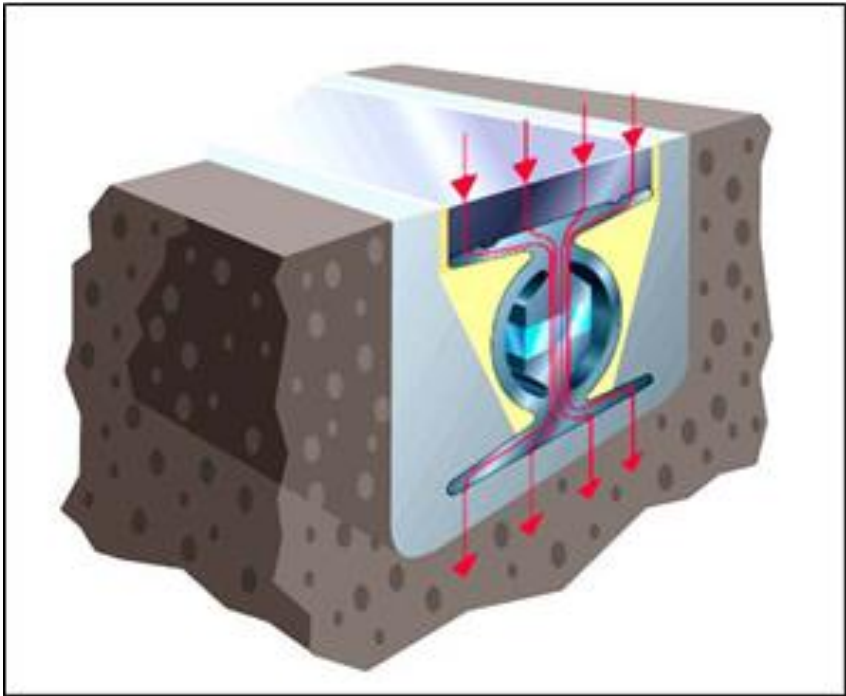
Cross Section of Piezoelectric WIM Sensor Installed in Asphalt.
